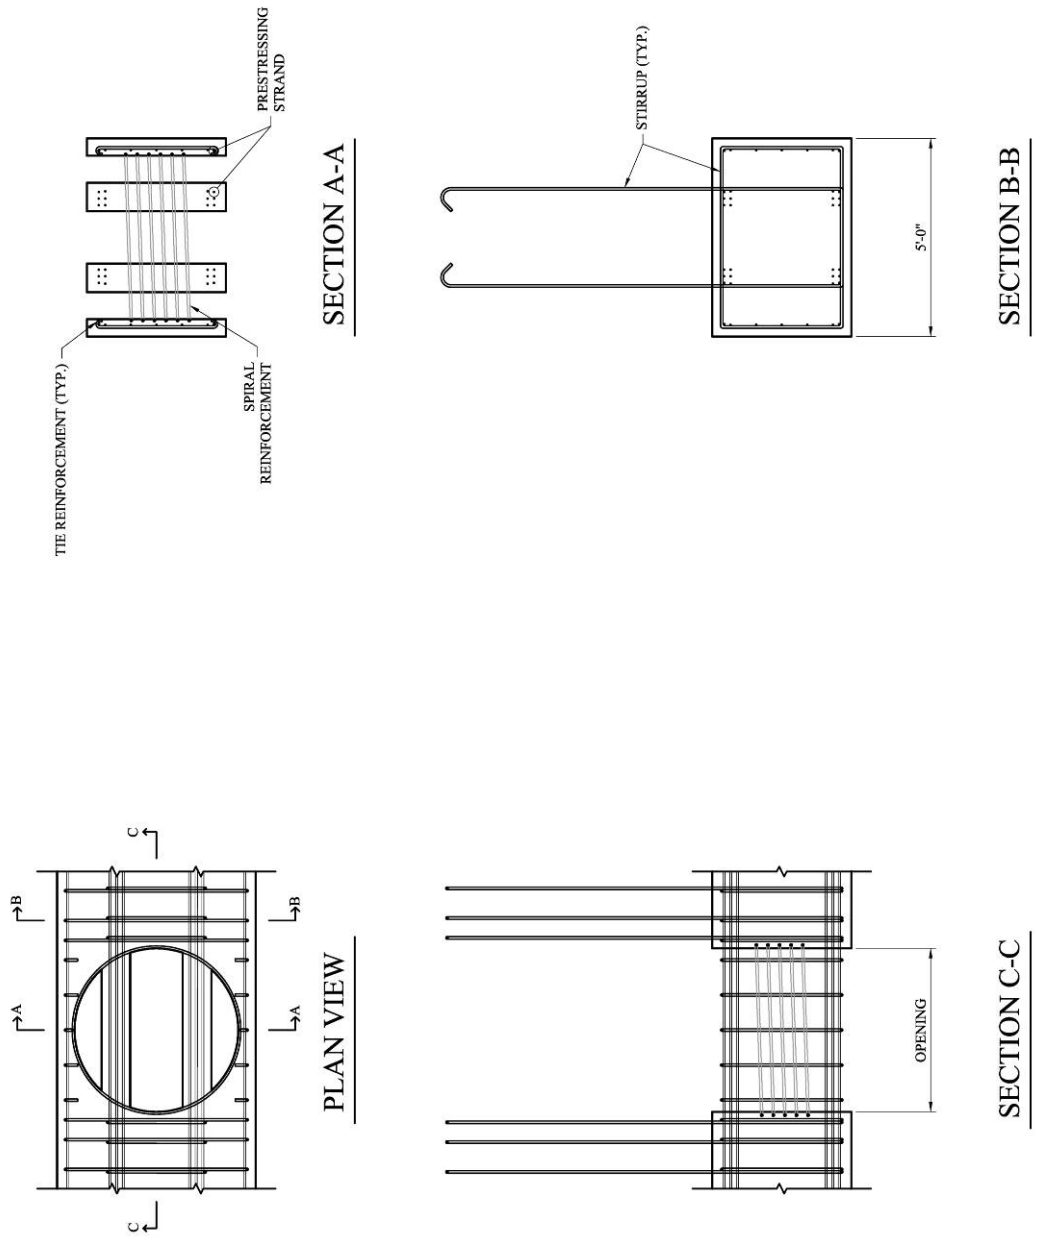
Cap-Beam Details for Slotted Opening Connection for Reinforced Concrete Frames
